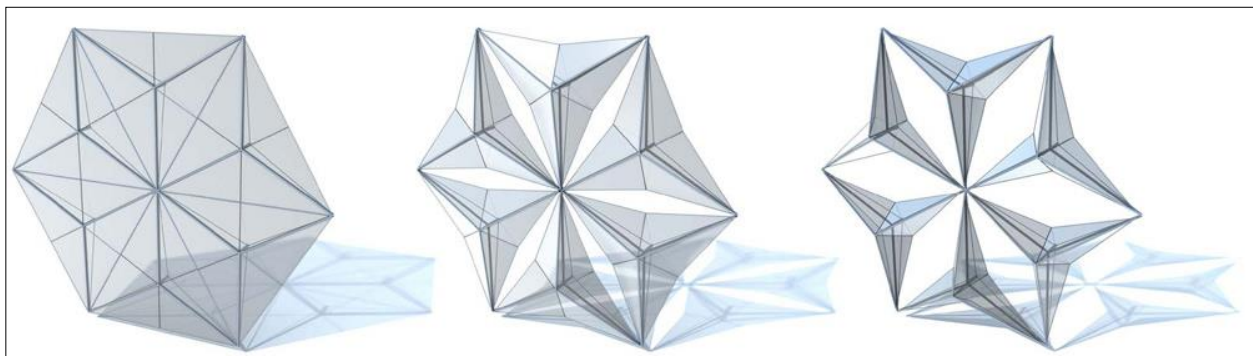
Al Bahar kinetic pattern unit CAD drawings
